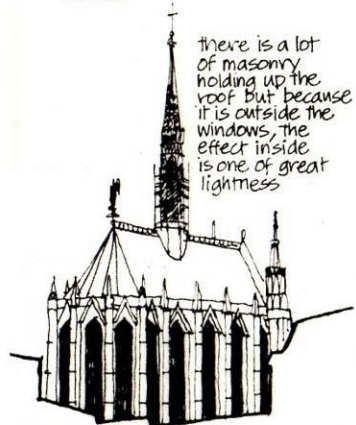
/818 buttresses turned at right angles to walls and located outside windows
